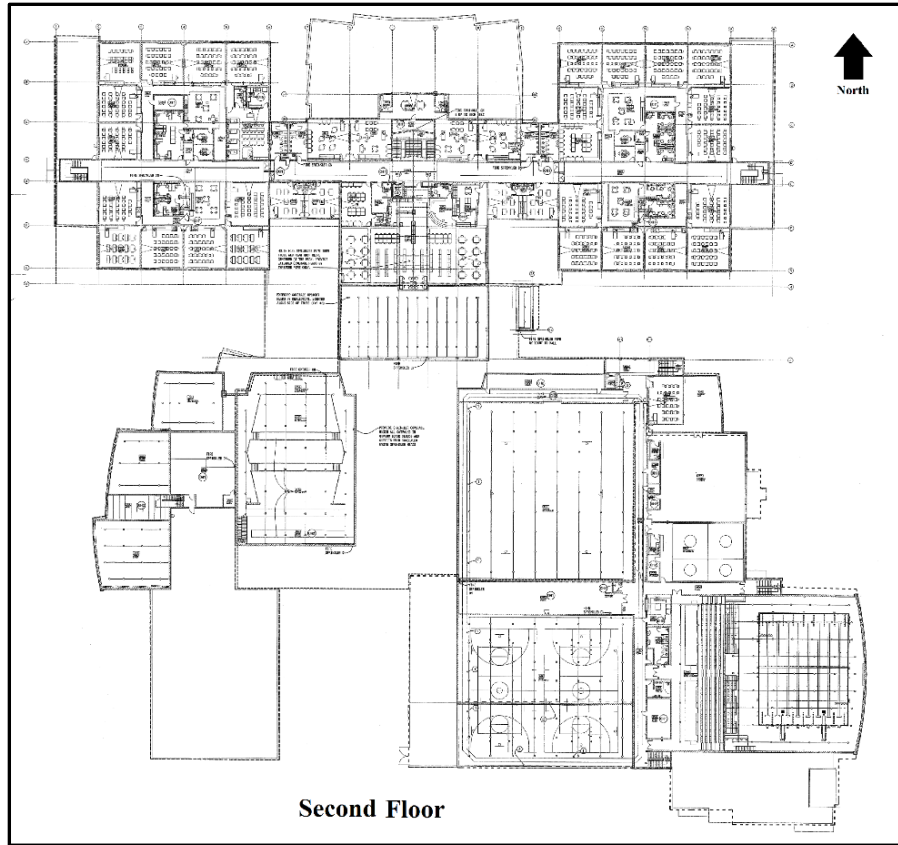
Judge Ronald N. Davies High School 2nd Floor Plan
